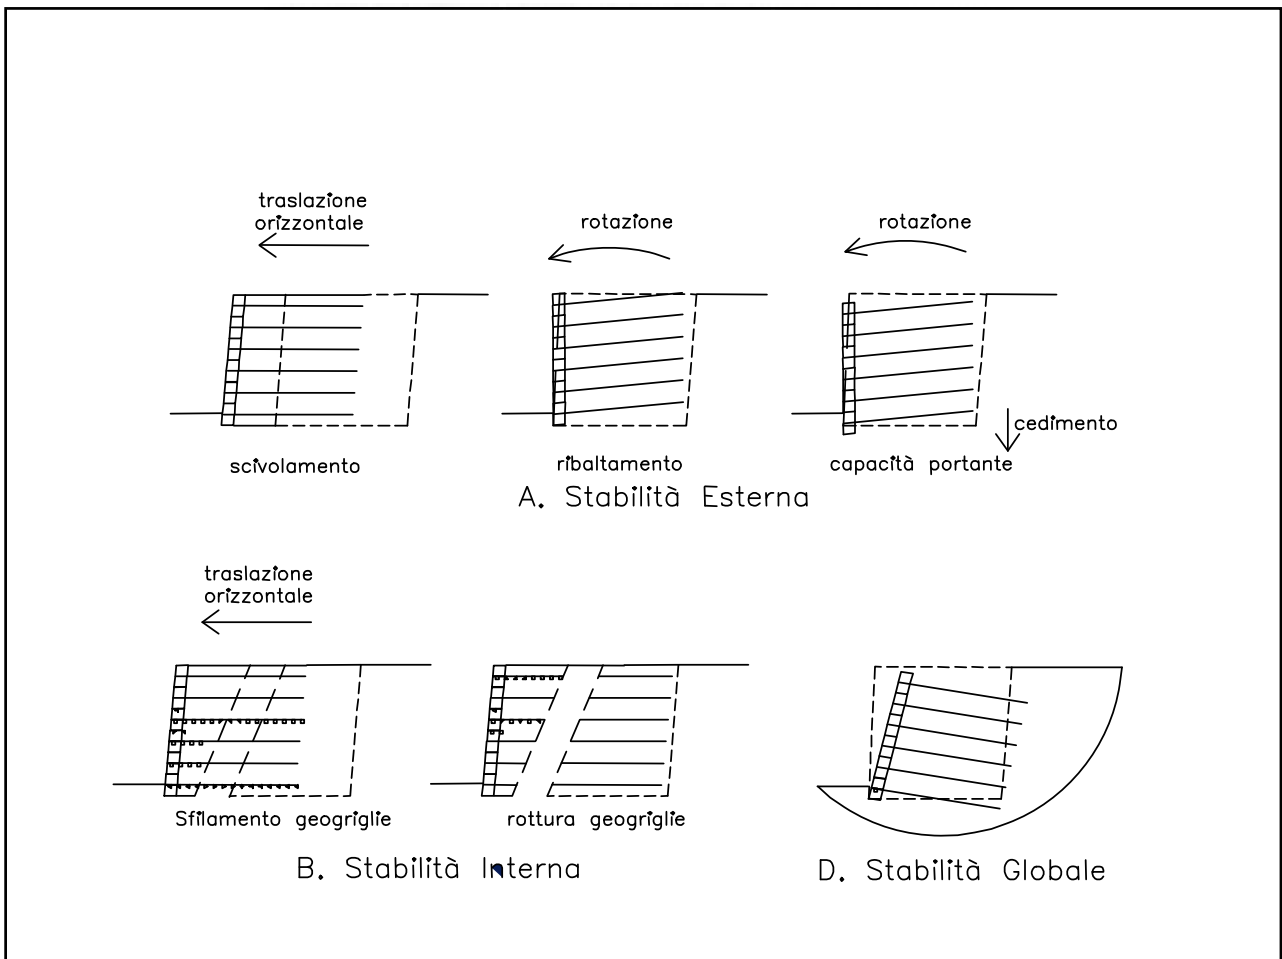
Stability analyses for reinforced soil walls: A) external stability; B) internal stability; D) global stability
